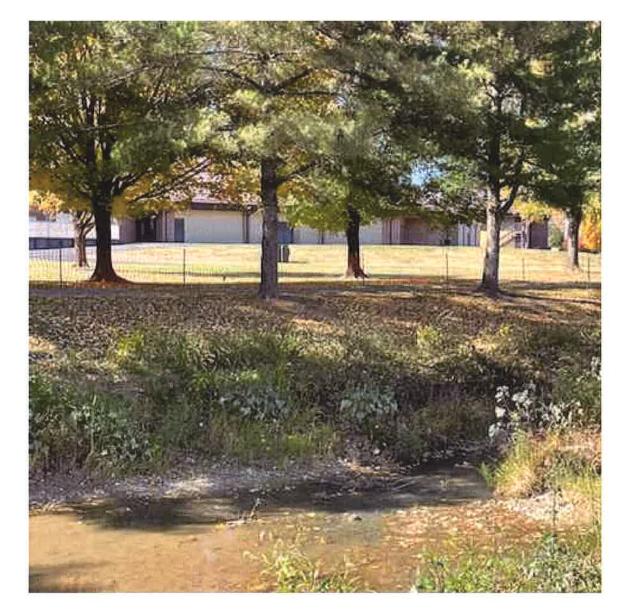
LOCATION OF PROPOSED SOUTH HEADWALL
